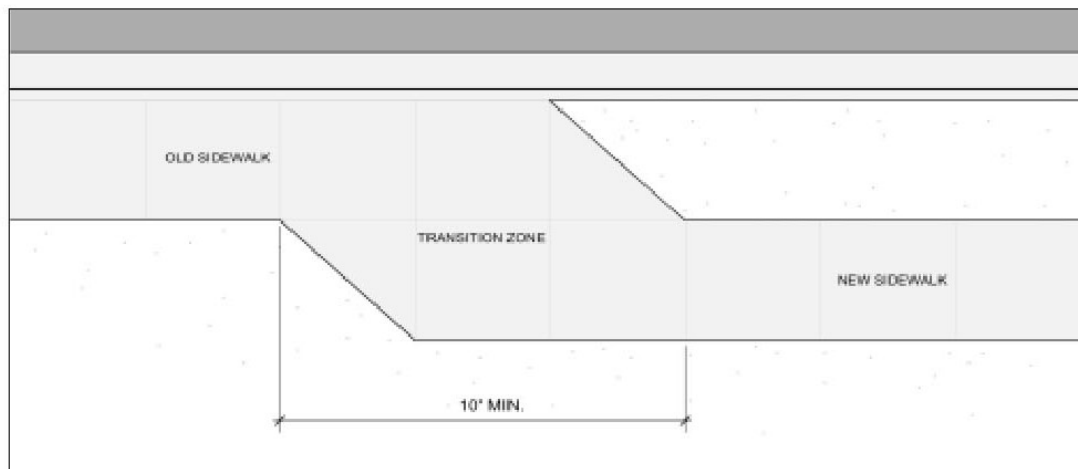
A transition zone is necessary when a new sidewalk and an old sidewalk meet mid-block.
